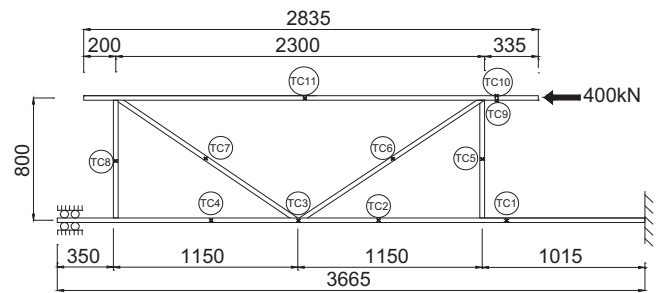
Test specimen SP1 of Liu et al. [8] (dimensions in mm).
